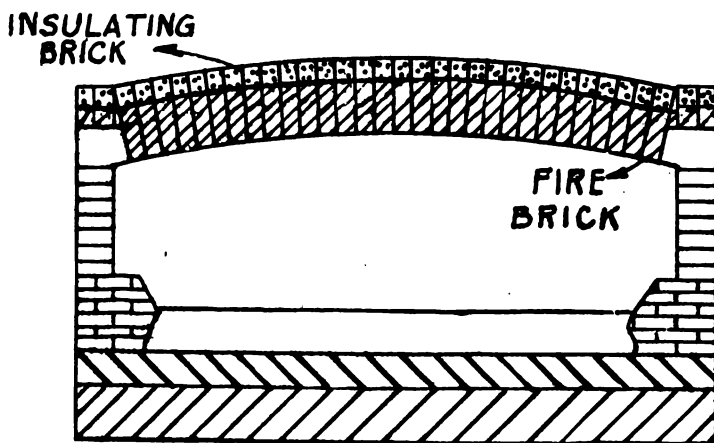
REVERBERATORY FURNACE ROOF COVERED WITH INSULATING BRICK.
